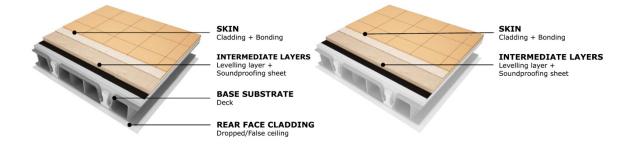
Components considered in new building work (left) and in refurbishment (right)
